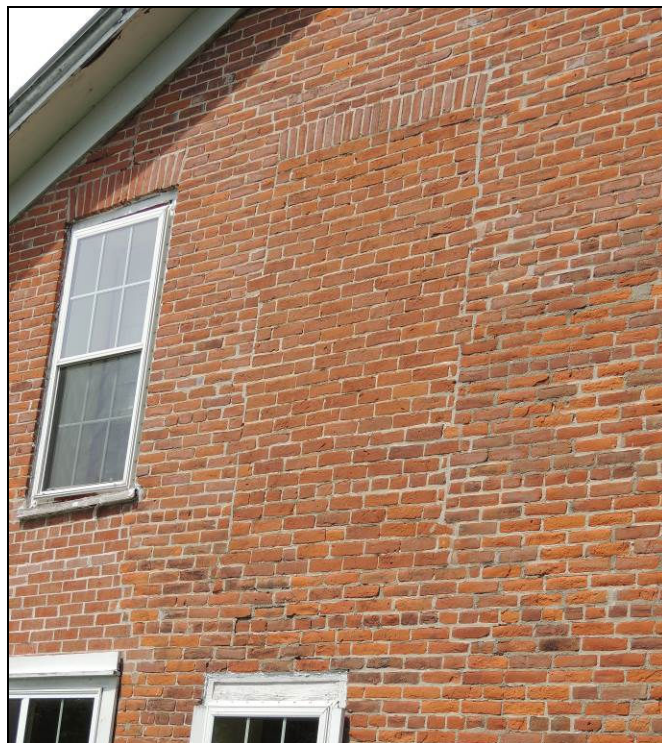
Detail of brick-filled loft doorway on rear (east side) of Smith House.
